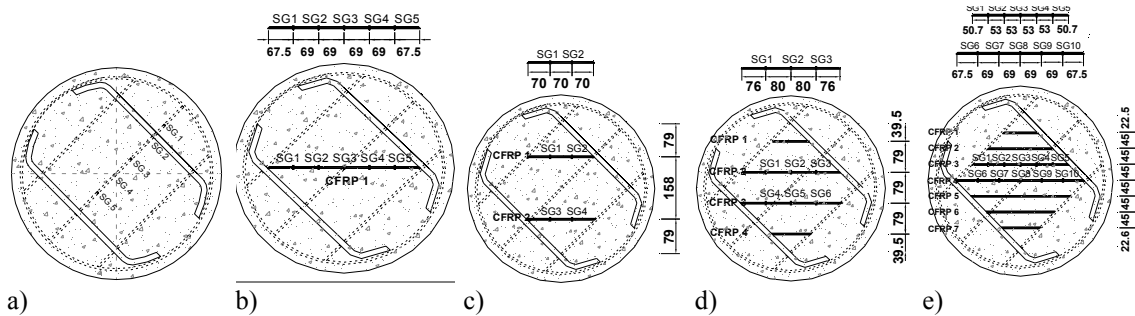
Strain gauges applied on the: a) steel stirrups; b) c) d) e) CFRP strips (dimensions in mm).
